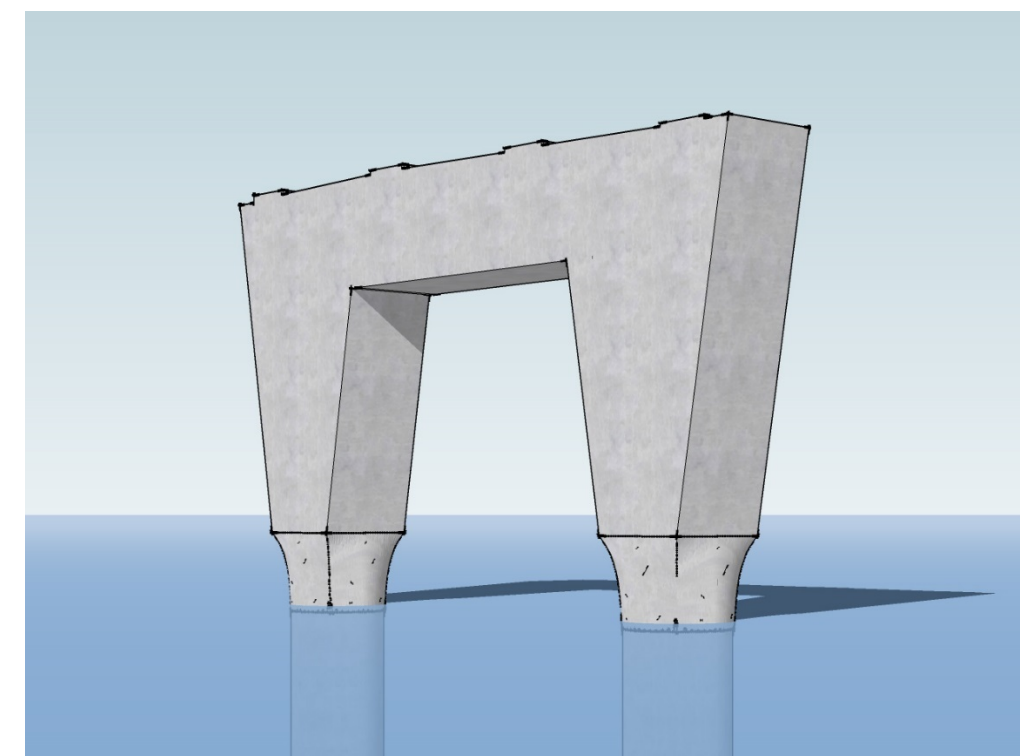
Rendering of Inverted U-Frame Pier
